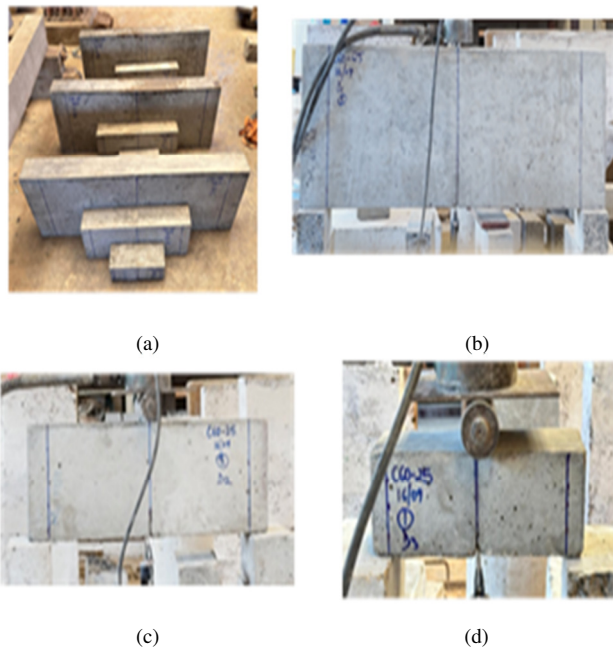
(a) Concrete notched beam samples by size, (b) specimen test setup for D1, (c) specimen test setup for D2, (d) specimen test setup for D3.
